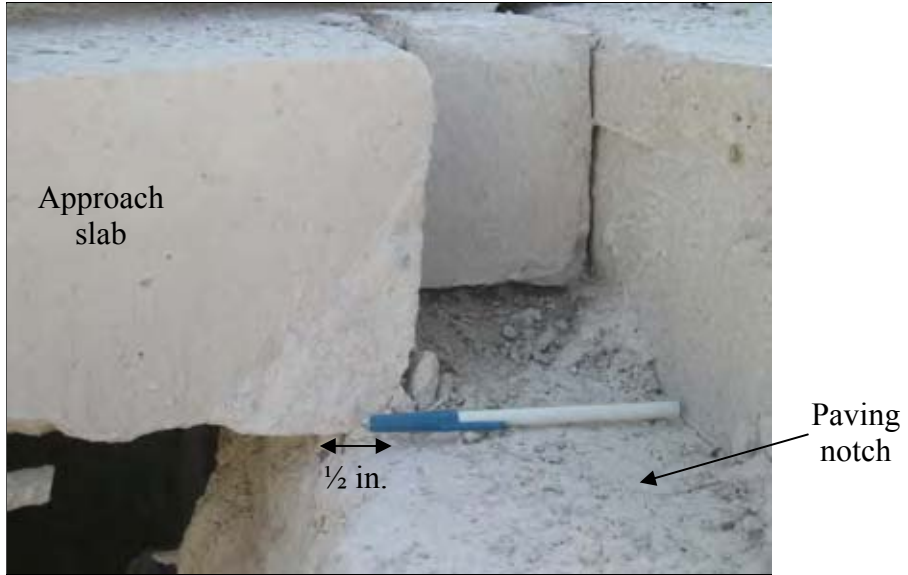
The approach slab resting on 0.5 in. of the paving notch (north end of SBL)
